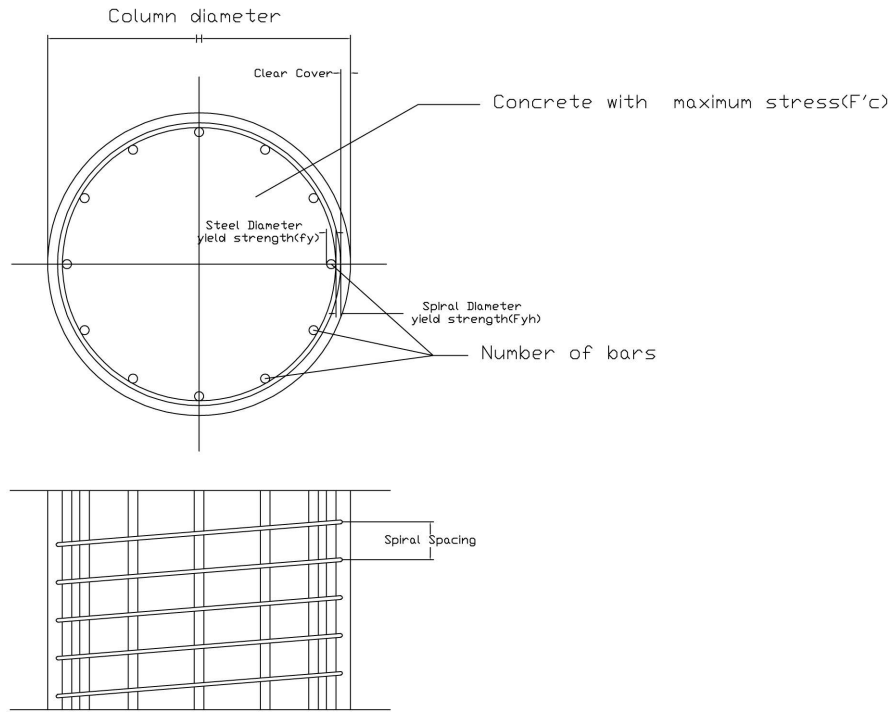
Cross section and sectional elevation for reinforced concrete column
